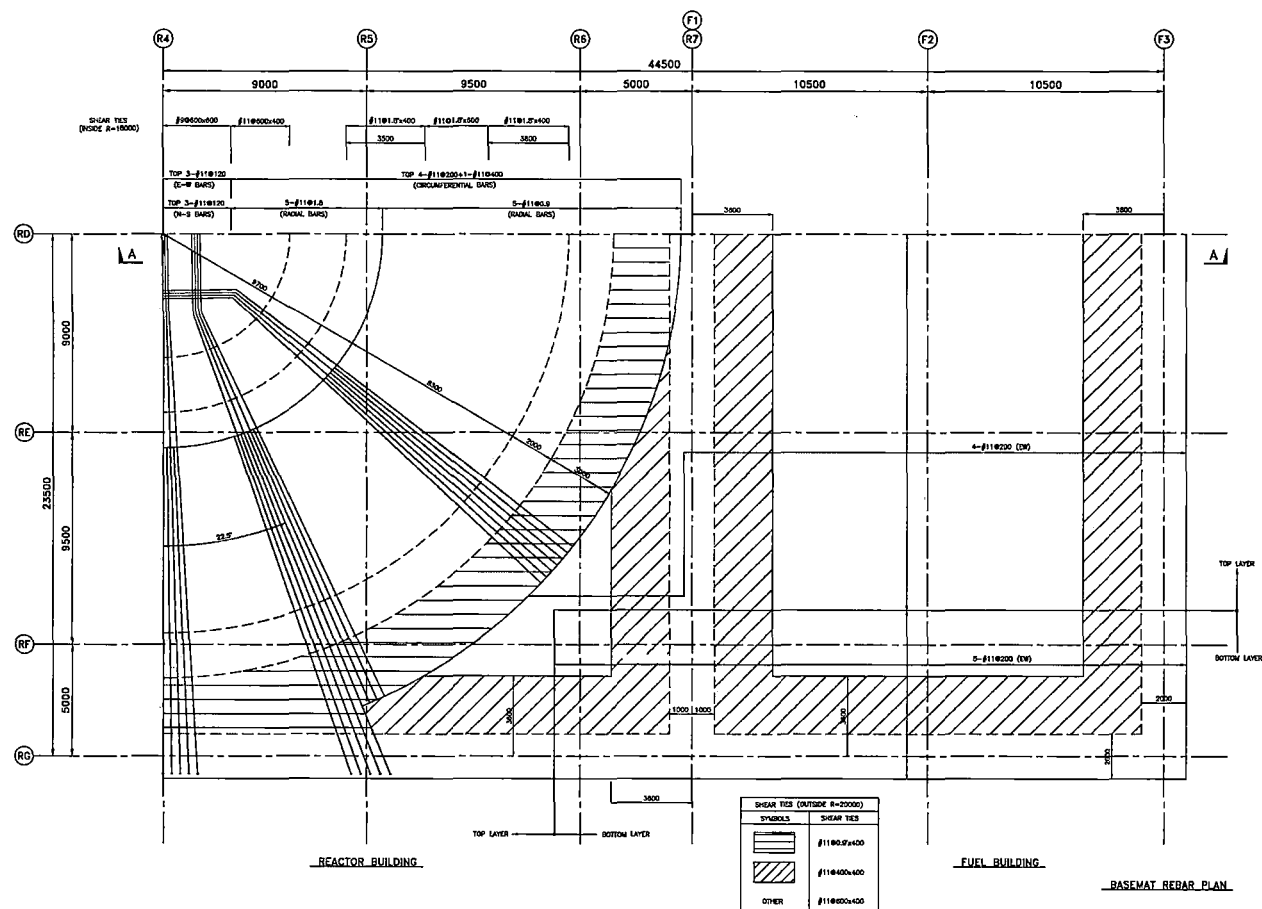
Reinforcing Steel of Foundation Mat: Plan
